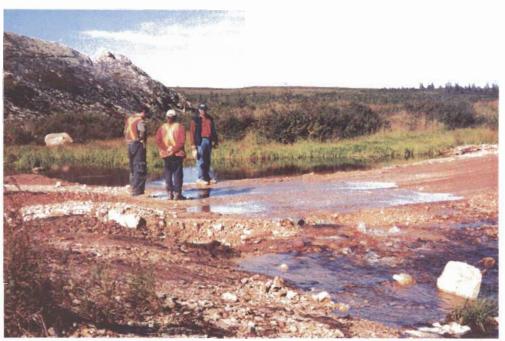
Close up view of the drainage creek from Shear Lake, as it crosses the access road. Photo is looking to the west.
